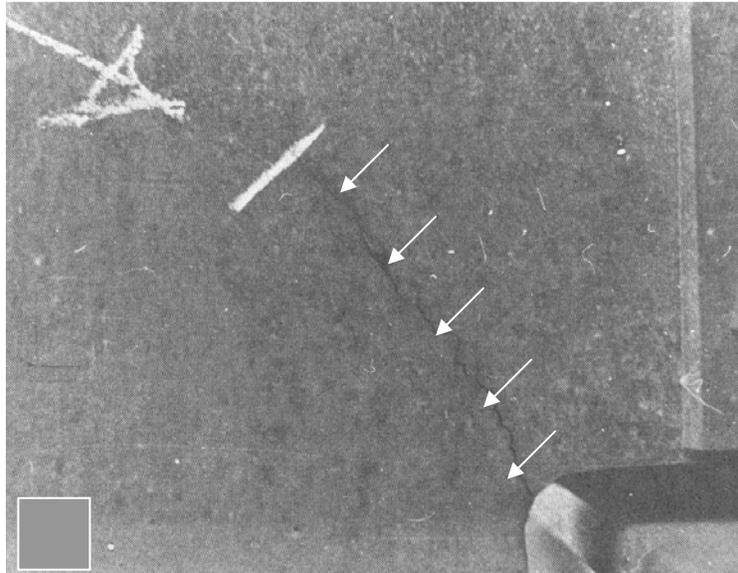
Crack originating from the coped stringer of Hwy 51.5 Bridge (Adapted from Fisher 1984)
